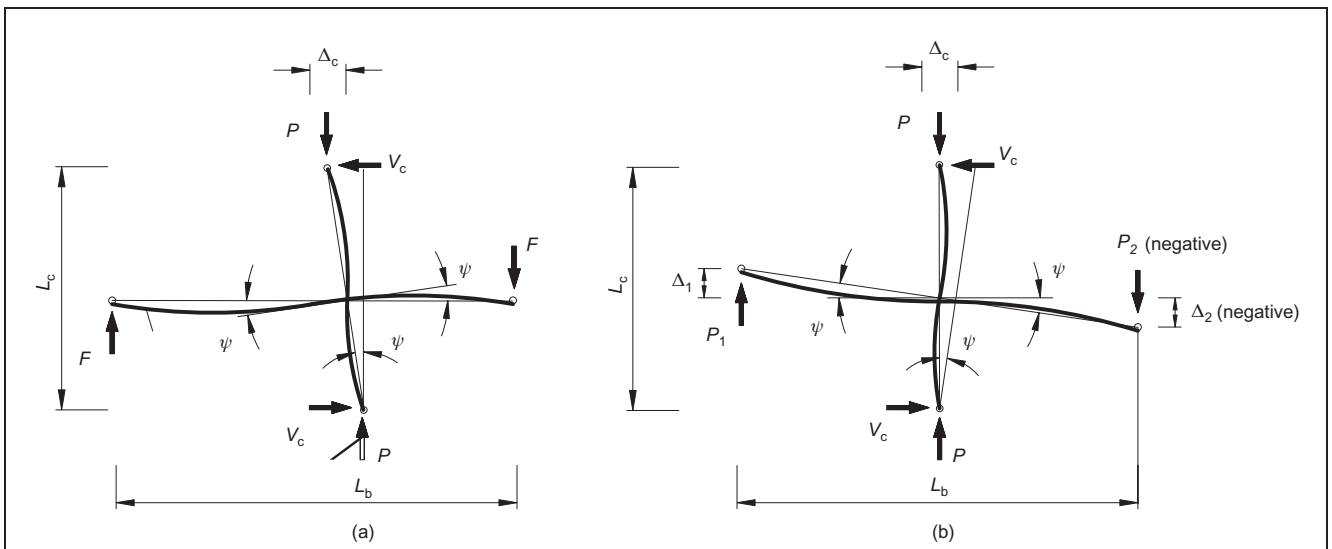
Simulation of interior beam-column joint assembly by test specimen: (a) deformation of a typical interior beam-column joint assembly under lateral load; (b) assembly in loading rig
